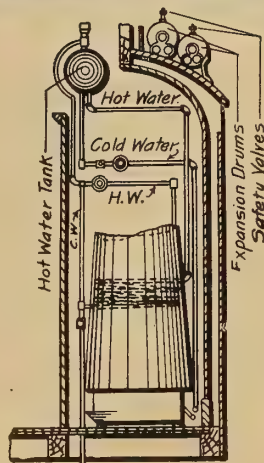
SECTIONAL VIEW OF HEATER AND PIPING.
